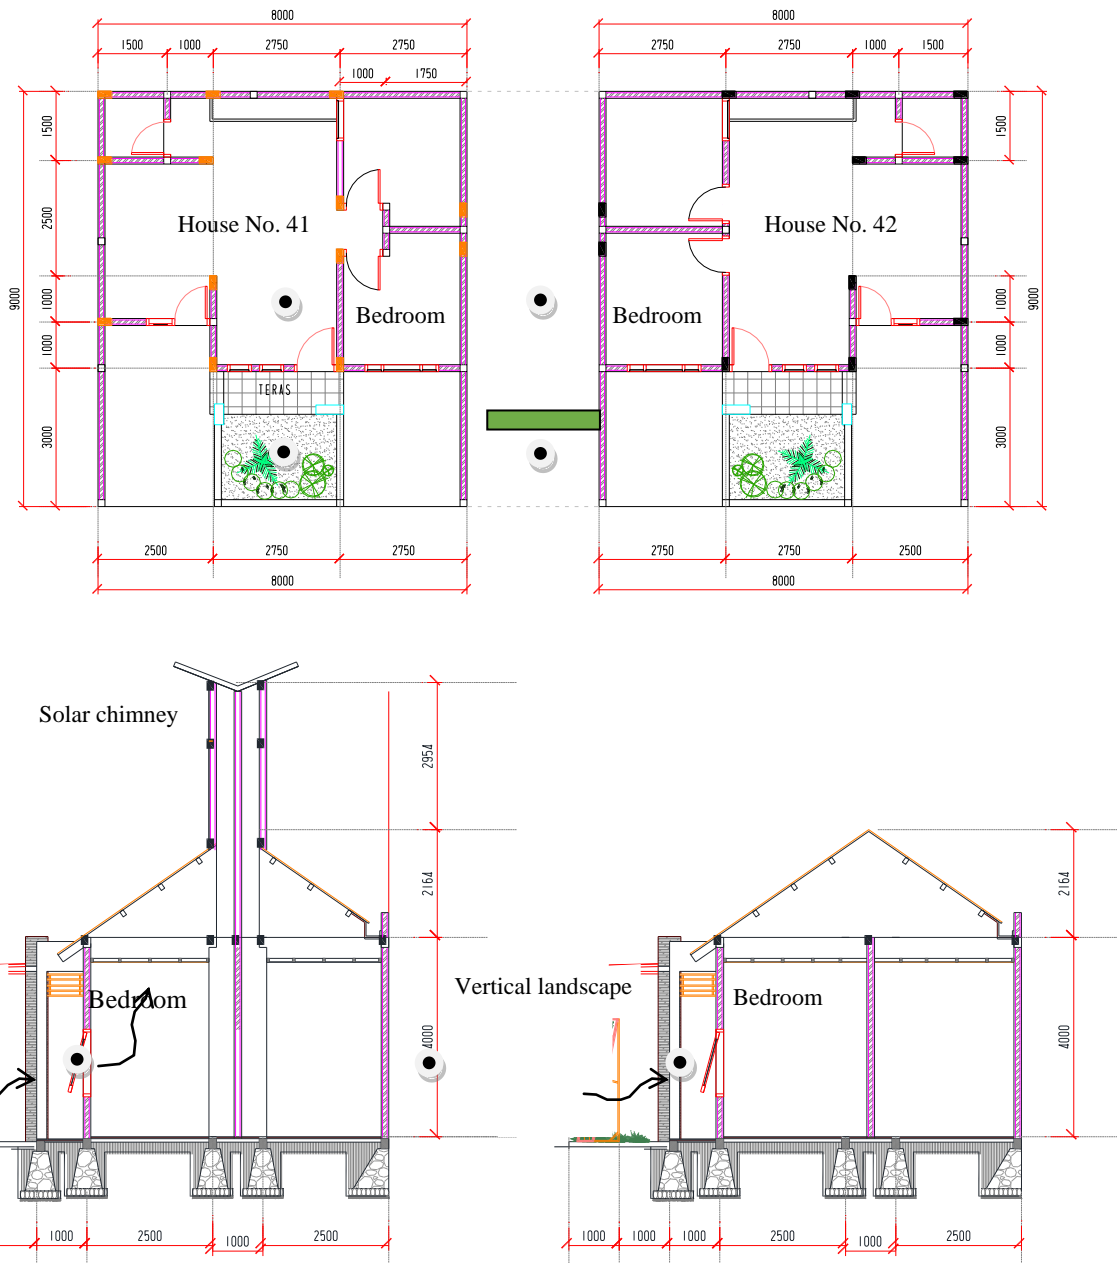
The positions of onset hobo data logger in single storey terraced houses (●); the top is plan and the bottom is west section
